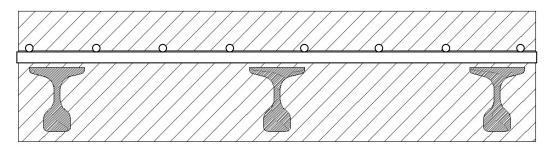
F(3) - TYPICAL CROSS SECTION
